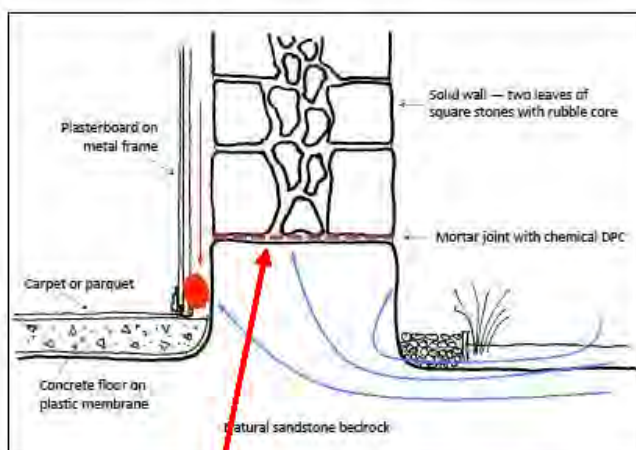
Schematic section through the external wall in the northern part of the main building. Dampness (blue arrows) penetrating from the gardens and percolating through the bedrock can reach the inside face of the wall, because the damp-proof course (DPC) is positioned too high in the wall. Sand (red arrow) from fretting sandstone falls down the void behind the plasterboard linings and accumulates at the base of the void, producing a damp bridge across to the plasterboard (for example see Figure 11). The DPC should have been installed at the level shown in Figure 13.
